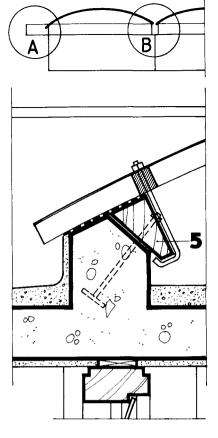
UMBRELLA ROOF OF THE MAMPROBI POST OFFICE IN ACCRA - ARCHITECT : HANNAH SCHRECKENBACH, 1972. THE UMBREL-LA ROOF IS CONSTRUCTED WITH DEEP TROUGH, SELF - SUPPORTING ALUMINIUM ARCHES WHICH ARE FIXED TO REINFORCED CONCRETE GUTTER BEAMS . THESE BEAMS CARRY AT THE SAME TIME THE CONCRETE ROOF SLAB OF THE POST OFFICE.
